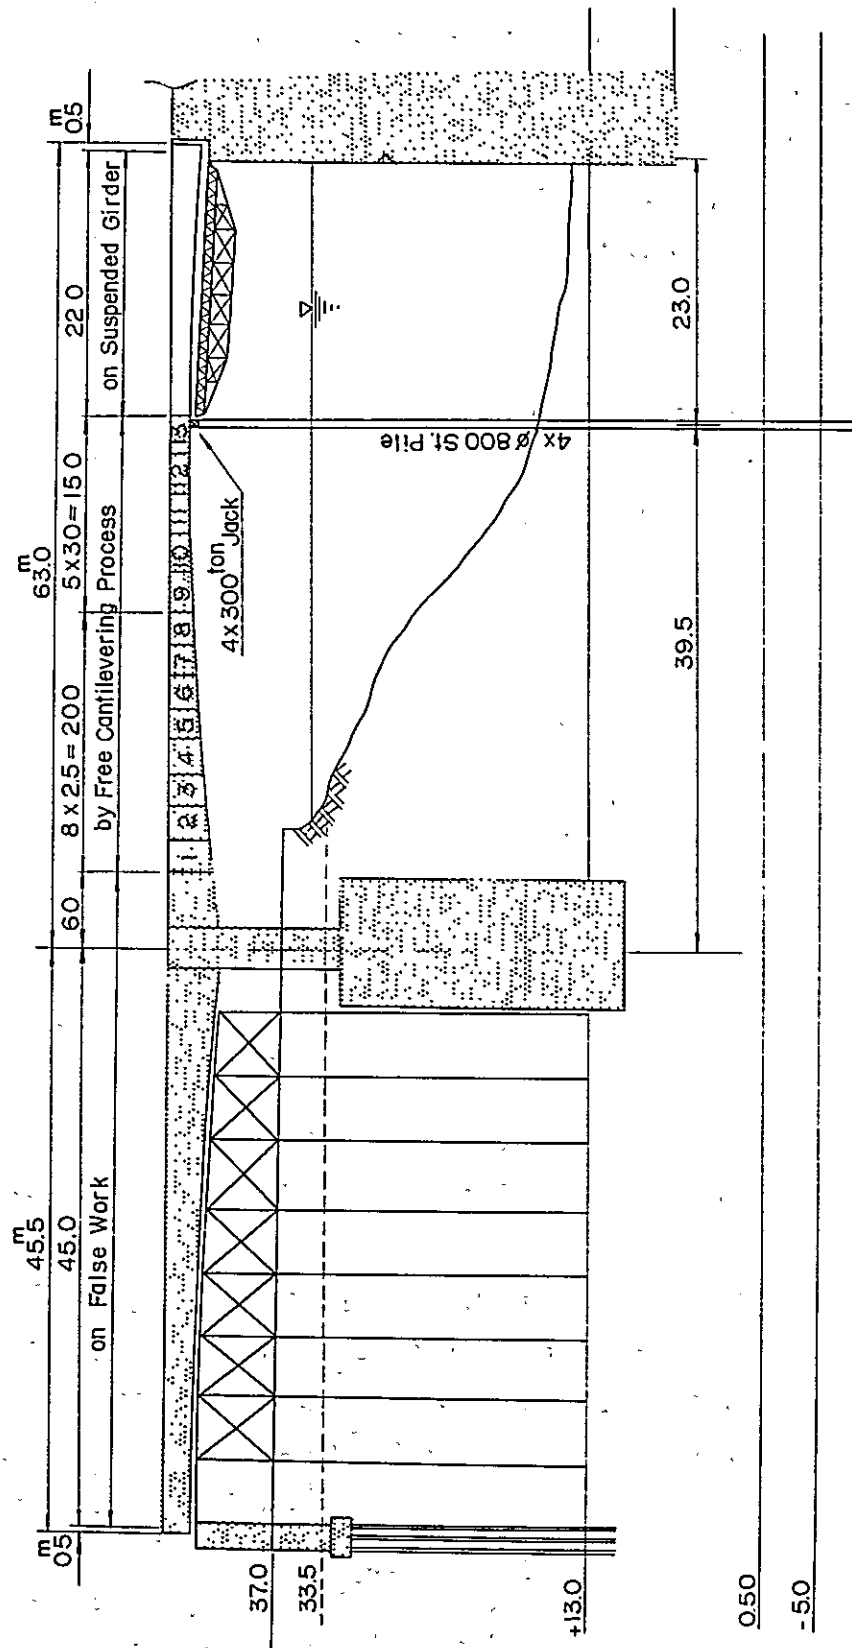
GIRDER ELECTION FOR APPROACH SPAN
